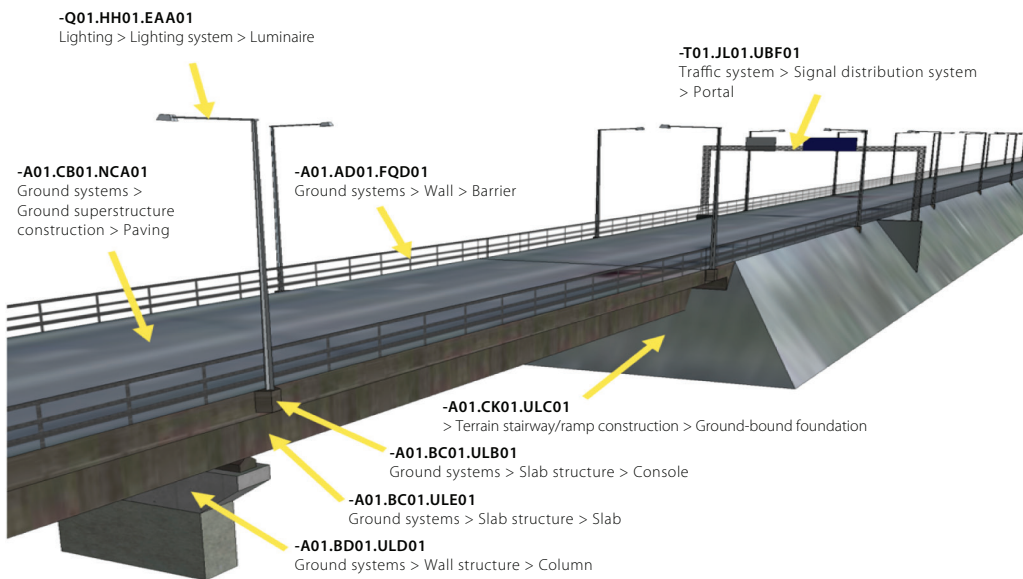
(Eckerberg, 2019) Construction entity, bridge, components
